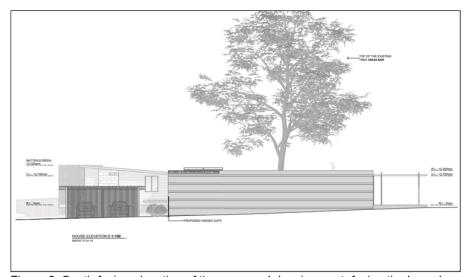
South facing elevation of the proposed development, facing the boundary with 56 Hall Street.
